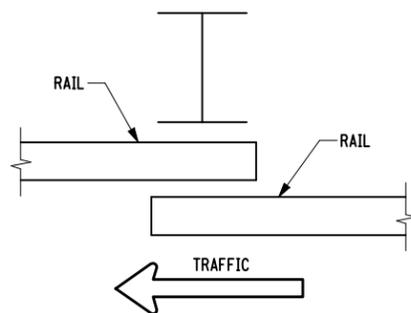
DETAIL "G" TYPICAL RAIL SECTION (SEE DETAIL "B" SHEET 2 OF 2)
